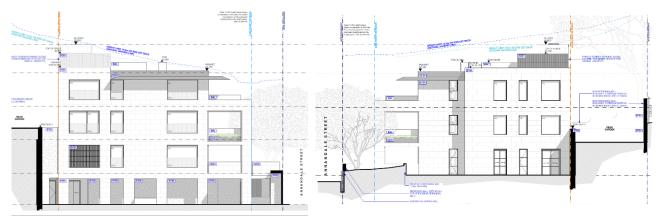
Left: North Elevation. Right: South Elevation (Source: MHNDUNION)
